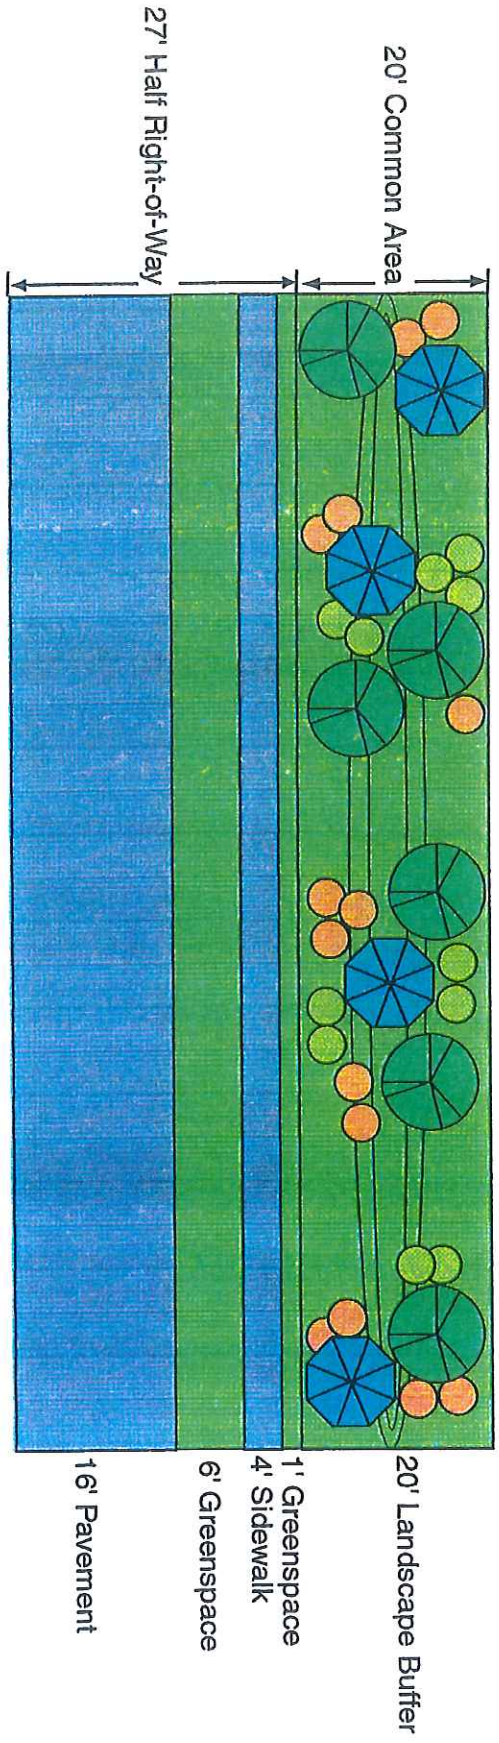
Exhibit H. (con't.) Landscape Buffer Detail 1: Marilyn Road & 141st Street (typical 100' section)
